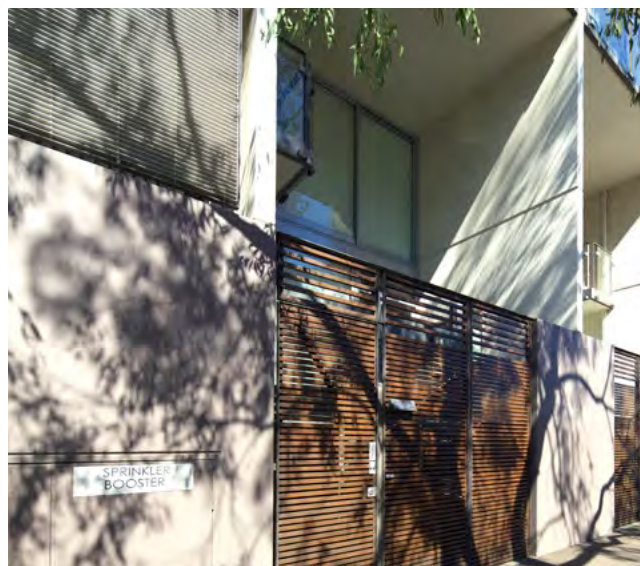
X.2 The building layout should provide easy access for maintenance and inspection of services and plant equipment
